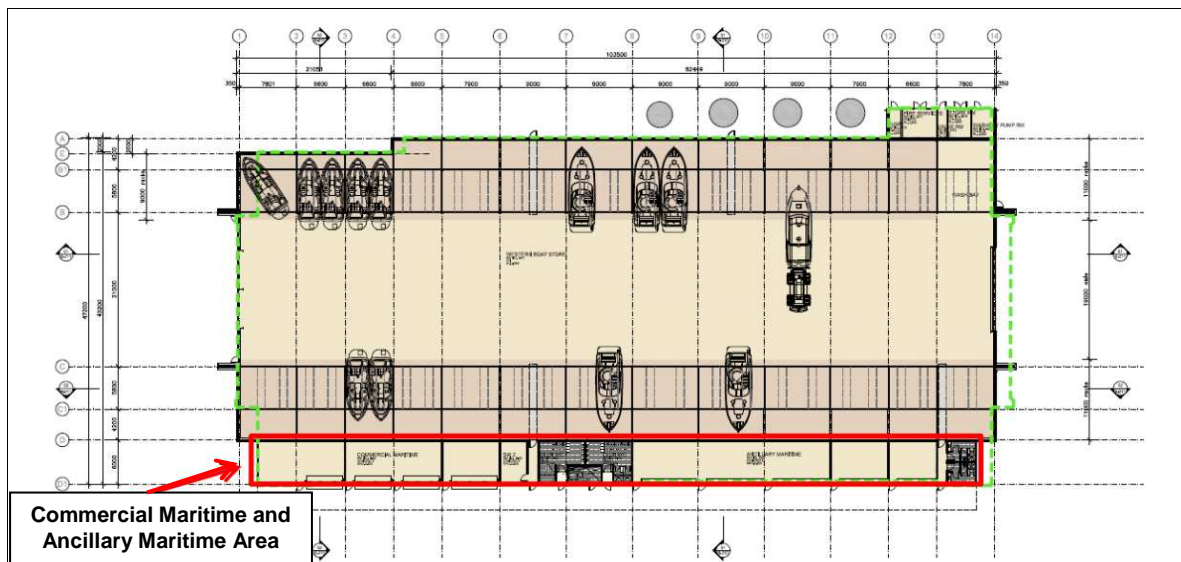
Approved Floor Plan of Western Boat Store (MOD 4)
